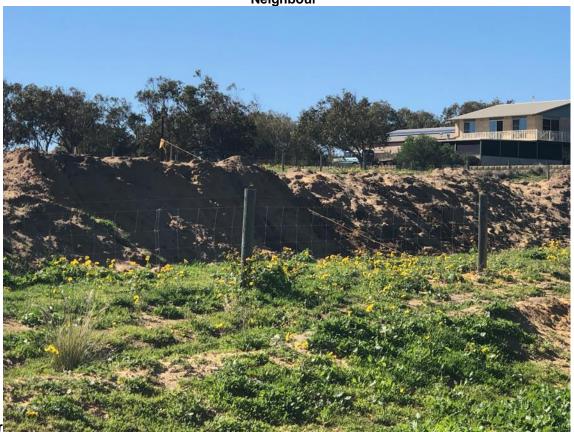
(e) above demonstrates the proposed fill height and slope batter (rope indicates potential slope). As the land slopes from north-east to south-west affectively the house will be at natural ground level on the northern side and then elevated on the southern side as the lot drops away. The applicant has indicated that this height has been chosen to prevent drainage issues for developing a future potential house at a lower level than natural ground level.
